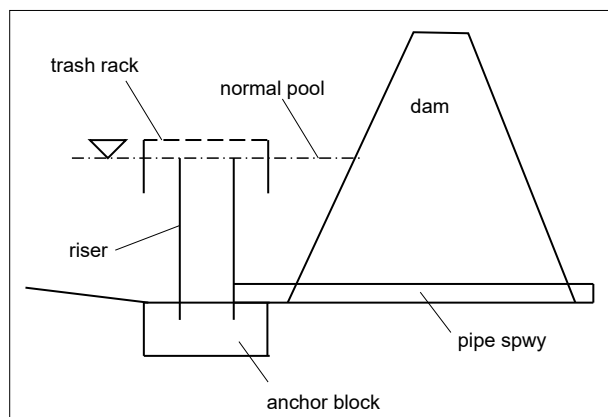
Anchor Block (Pipe Spillway Profile View)
